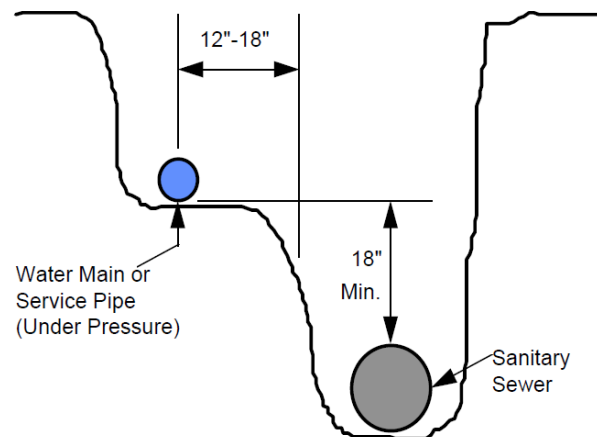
Pressurized Water Pipe and SSDS Pipe Trenches
